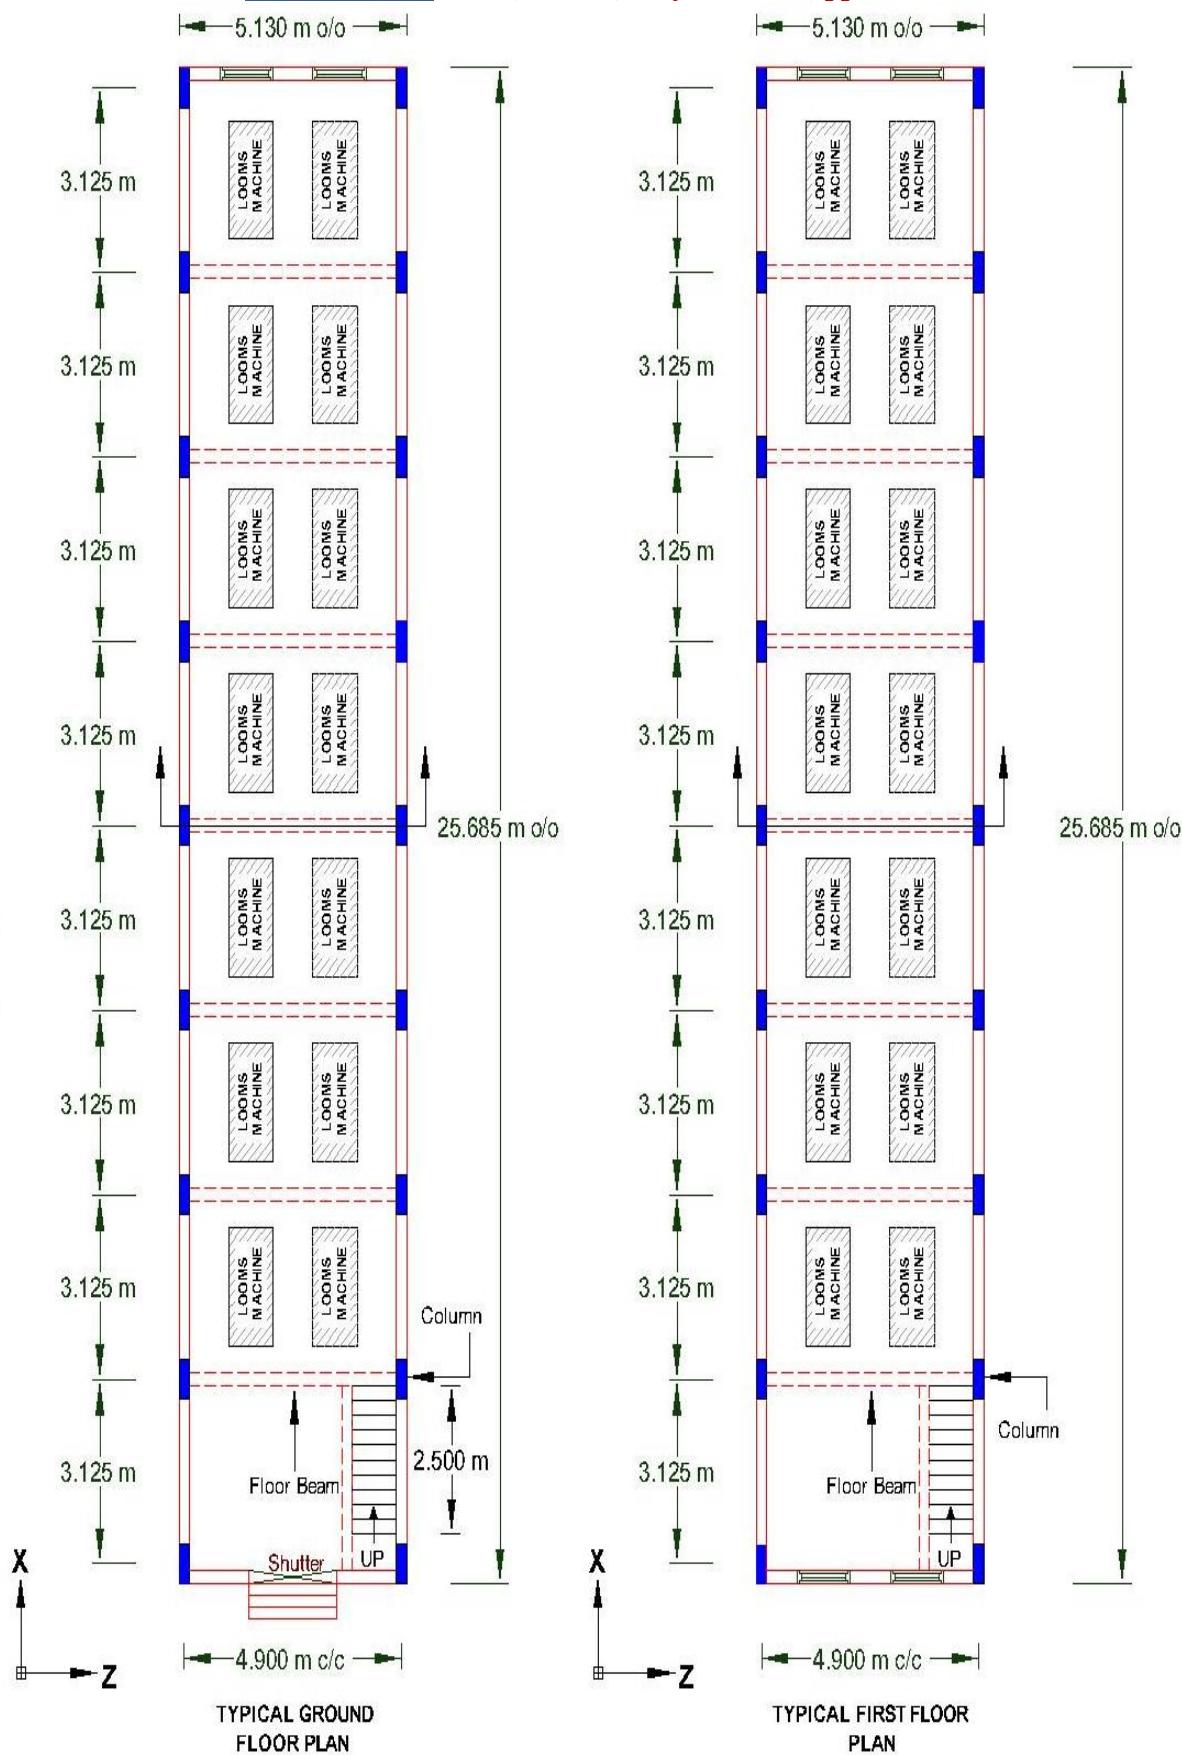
Typical Floor Plan of Looms Industry of Ground Floor and First Floor
